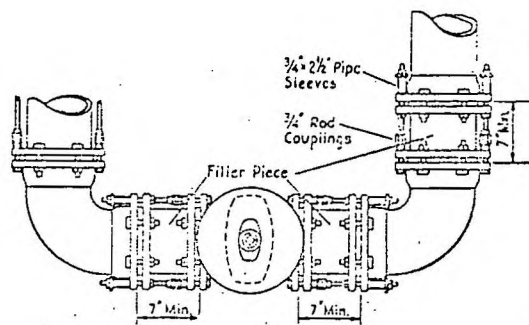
Indicator post valve; bell to one-quarter bend bell
